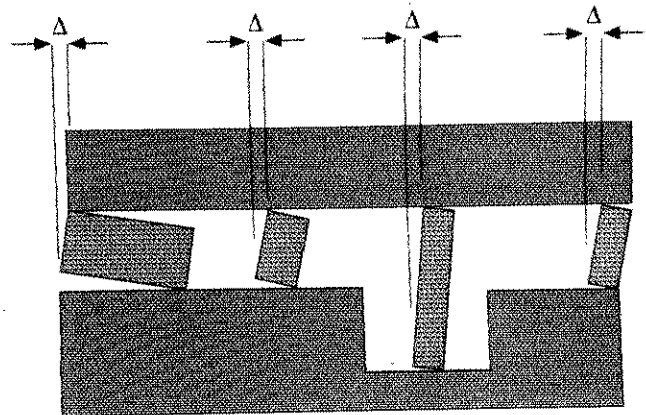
Schematic illustration of rocking failure mode, second storey, north wall.
